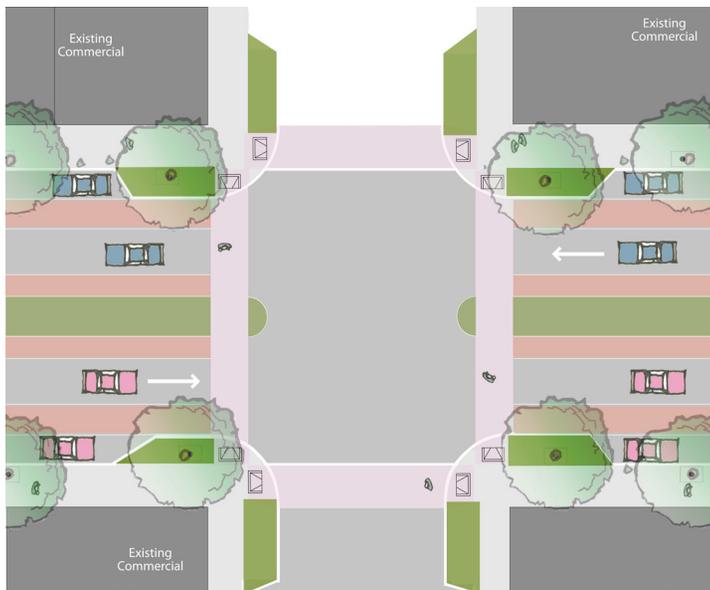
INTERSECTION AND BLOCK PLAN VIEW OF COMPLETE STREETS CONCEPT OPTION B (END BLOCKS)
